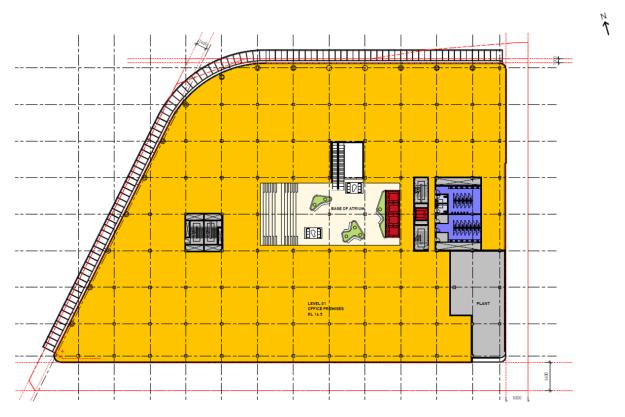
Proposed indicative Level 1 plan (Level 2 similar)
